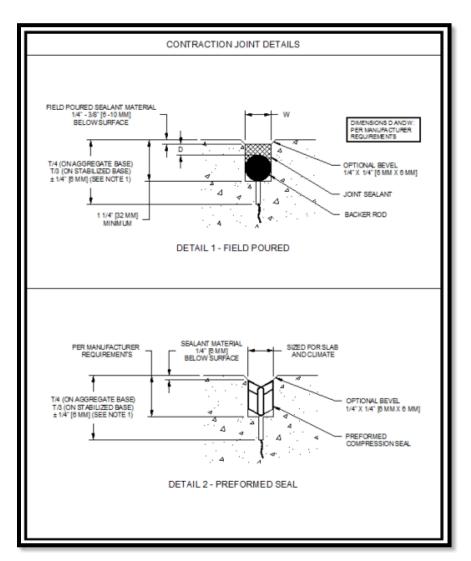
Rigid Pavement Joint Sealant Details.
